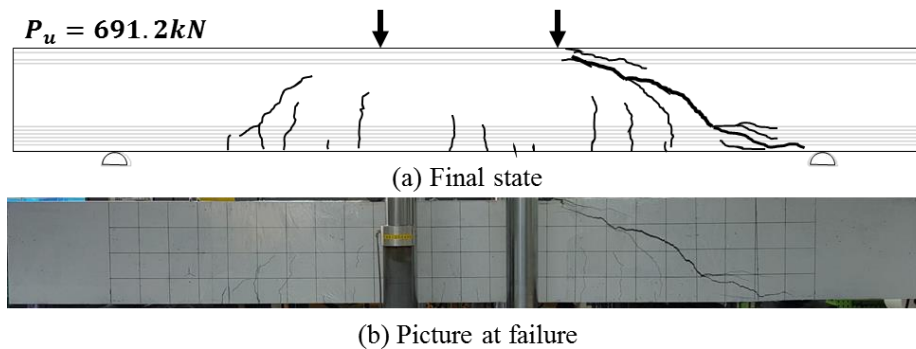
Failure mode and crack pattern of RC-S1 specimen
